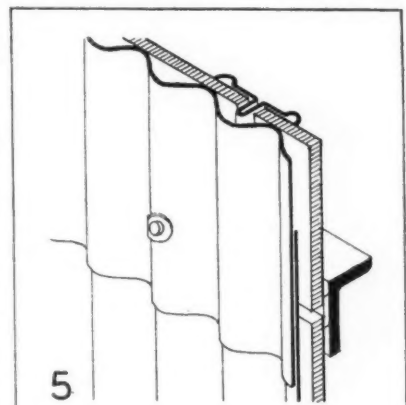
show a representative range of external walls constructed of a light framework. The external coverings are constructed of prefabricated sheets and boards.
